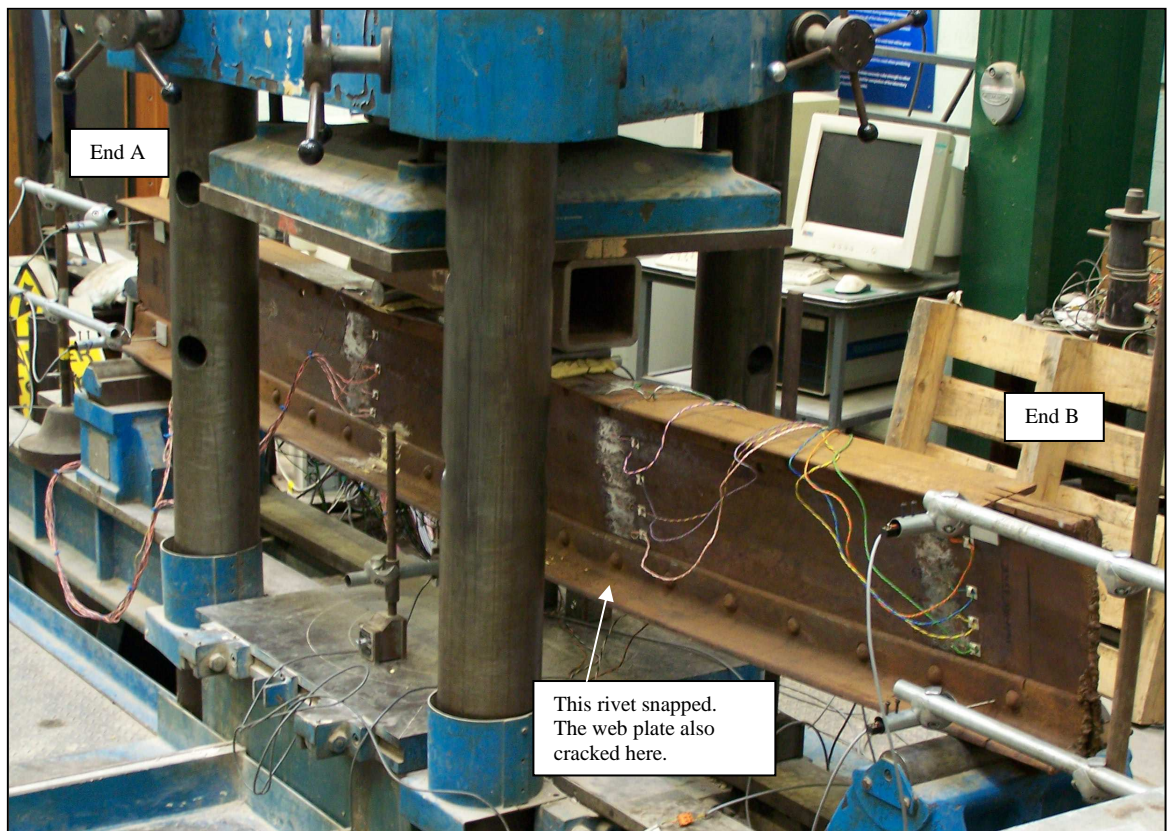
Test 2 – Test to failure of beam without timber. The front face of the beam is shown here. End B is in the foreground. (Photo by M.O'Sullivan 2008)
